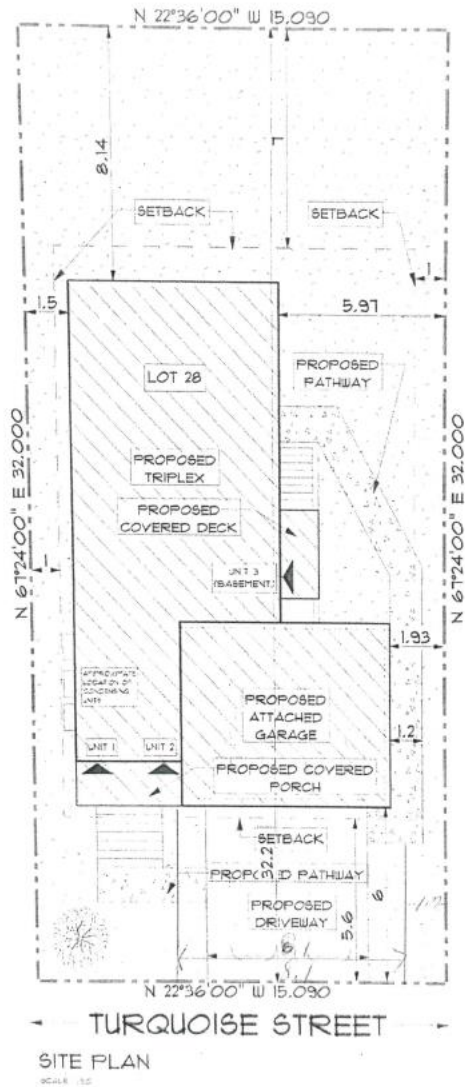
Site plan of the initial concept with a markup showing the wider proposed driveway to 8.1 m instead of the initial proposed width
